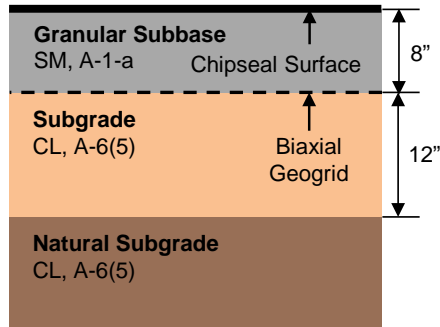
Existing roadway cross-section (prior to 2012 construction) on South Ave.
